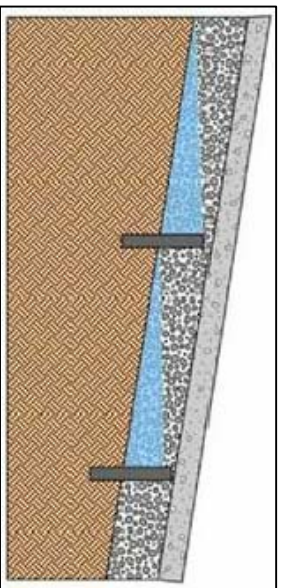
A. A "CHECK DAM" APPROACH MAY BE USEFUL IN LONG, SLOPED PAVEMENTS. SEE DETAIL ABOVE
